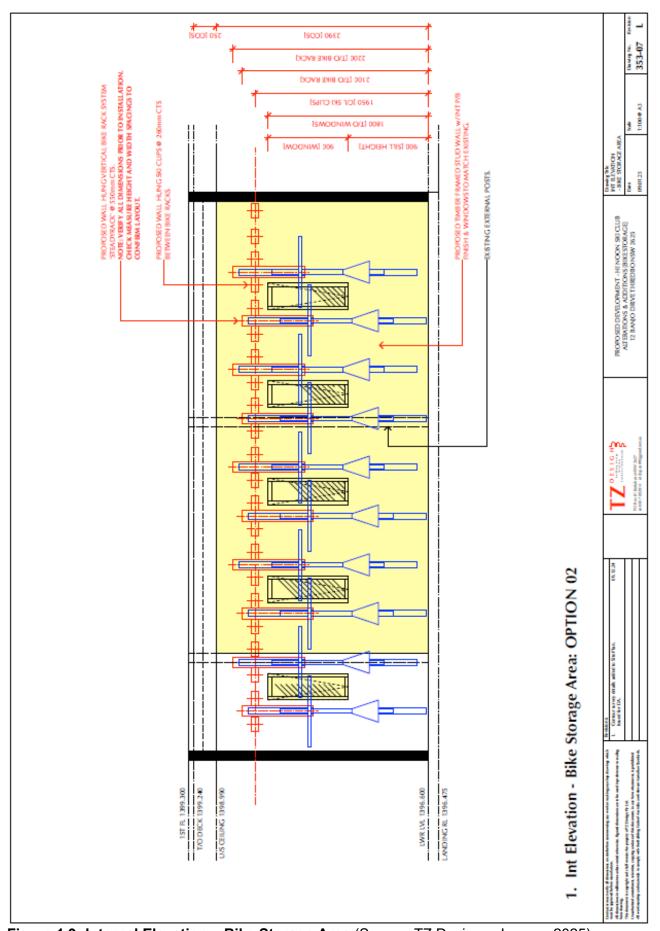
Internal Elevation – Bike Storage Area (Source: TZ Designs, January 2025)
